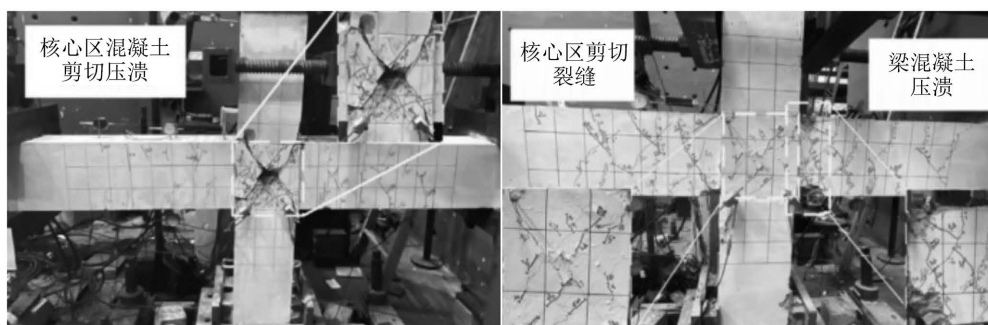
Failure modes of cast-in-situ specimens and prefabricated joints
